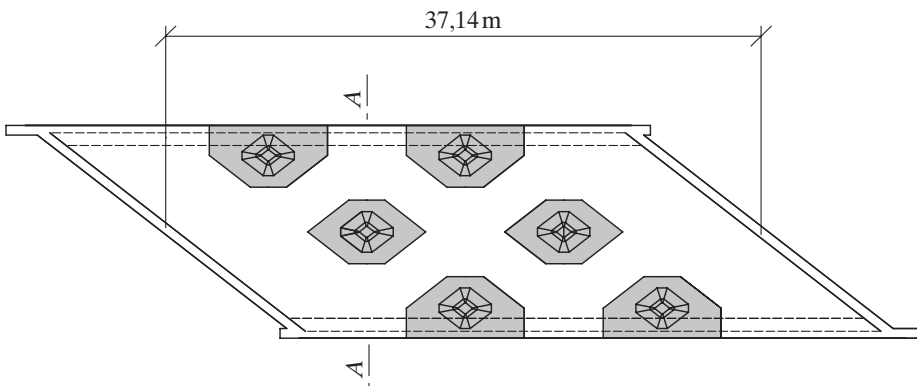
Massive slab bridge strengthened using R-UHPFRC over piers (dark areas)
